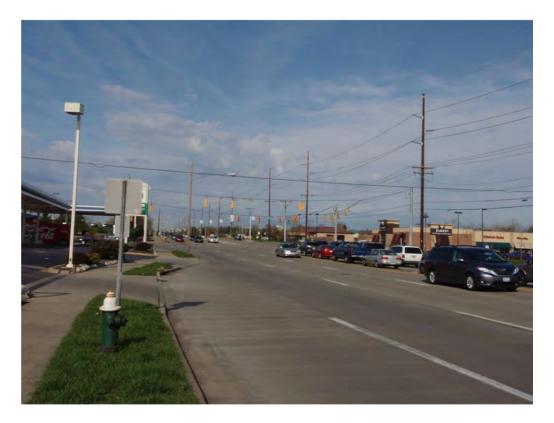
S.R. 82 and Howe Rd. south side, looking west
